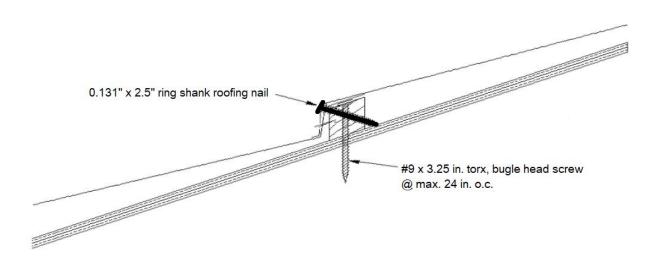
Over Batten Installation Detail (Systems 1 & 2)
